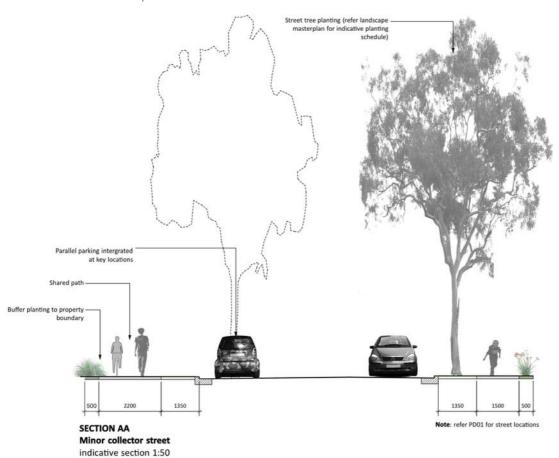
Typical Minor Collector Road (Road 5) streetscape - incorporating small parkland open space
